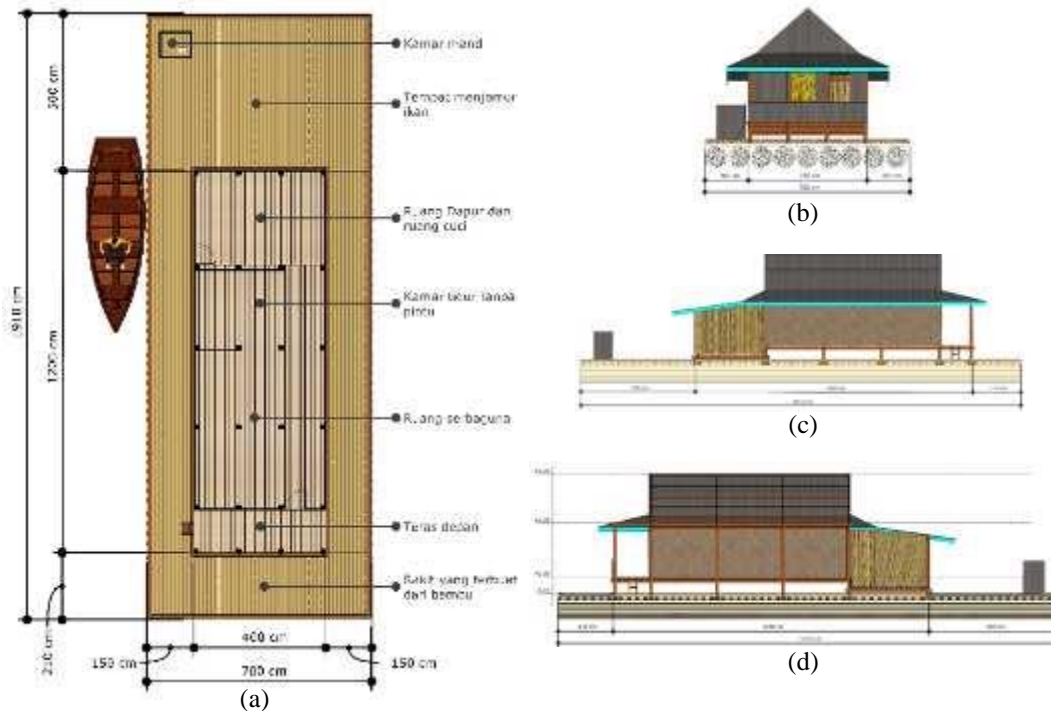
(a) Floating house plan, (b) Front view, (c) Side view, (d) Section
